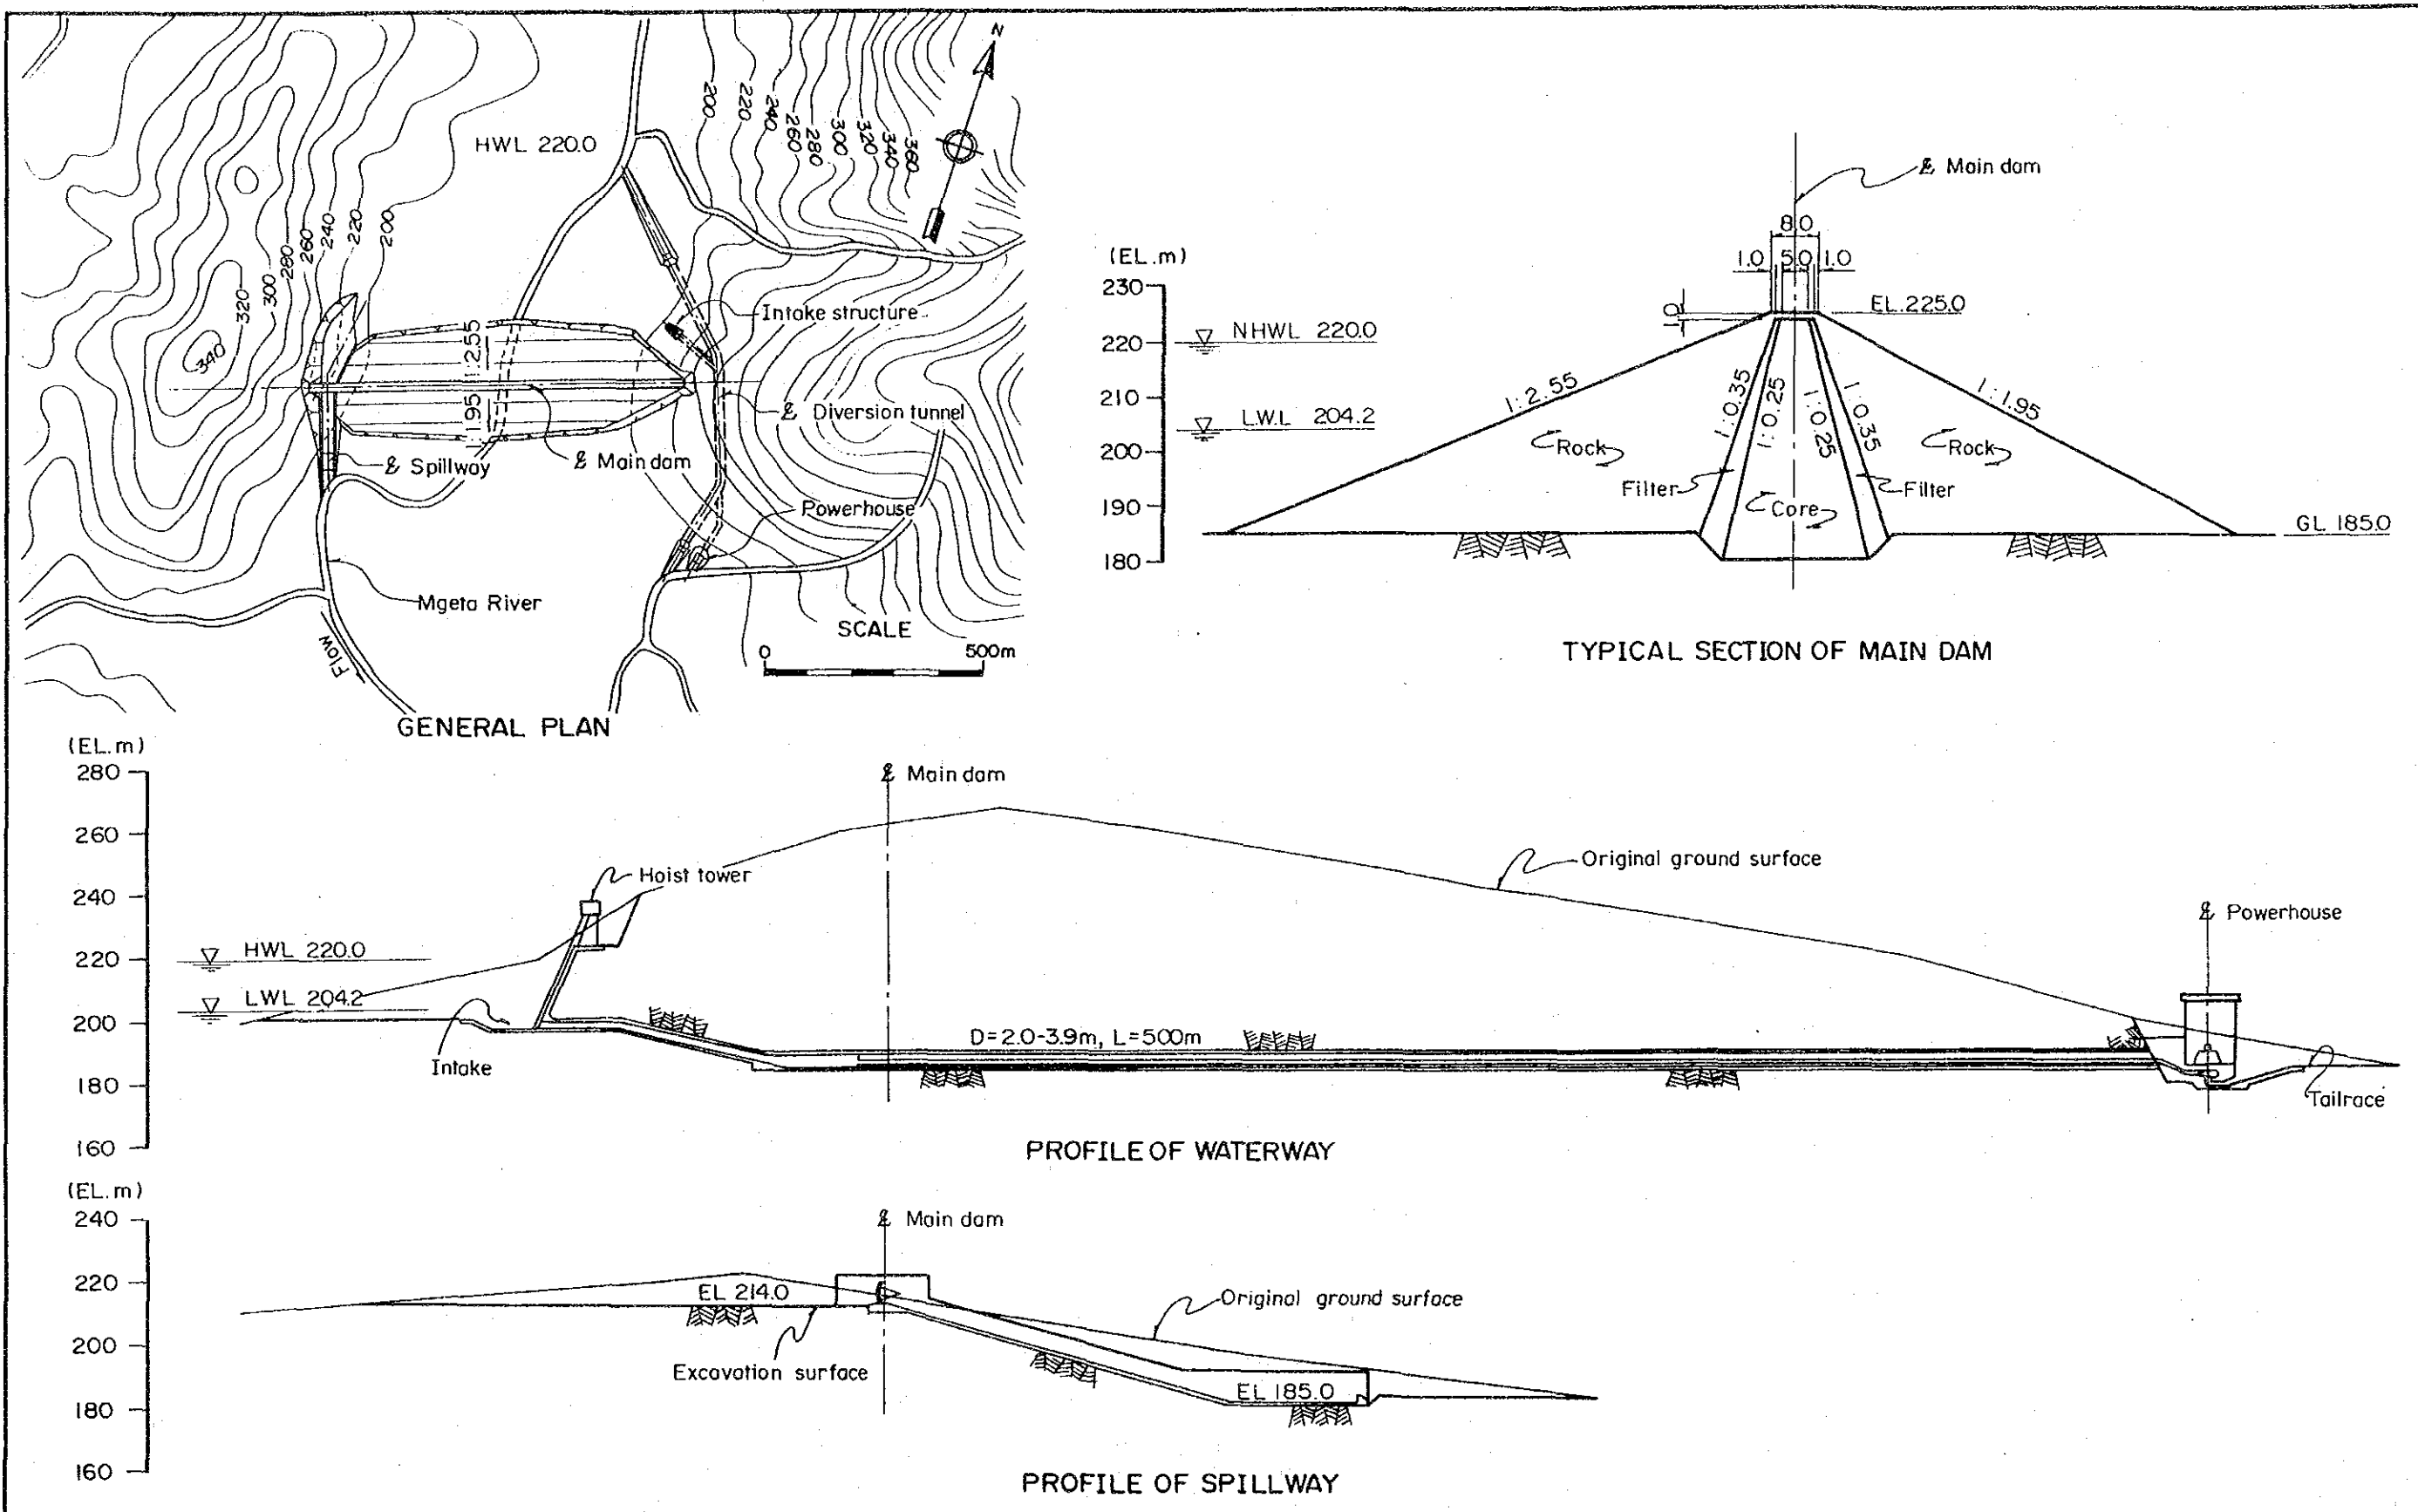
LAYOUT PLAN OF MGETA DAM PROJECT
